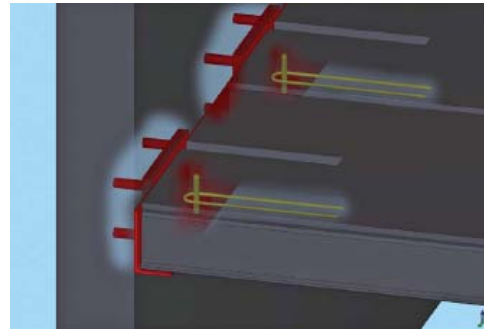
Principle connection of deck elements with interior concrete shear wall.
